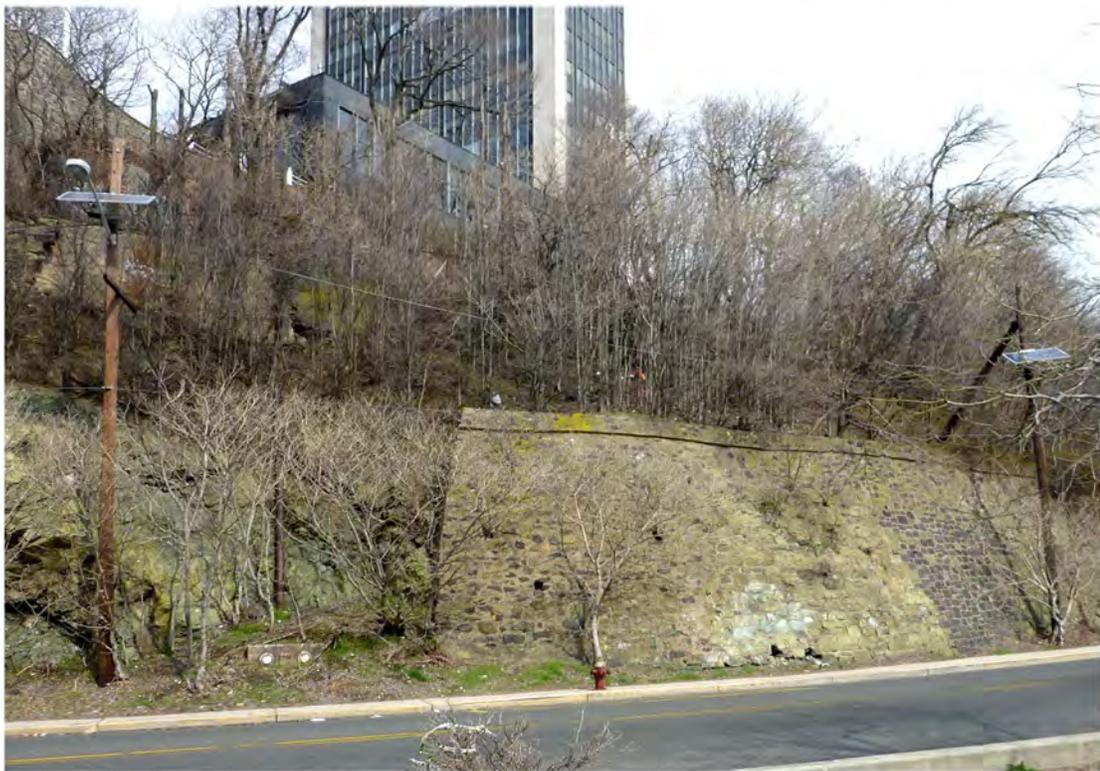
The ca. 1857 serpentine stone retaining wall below Castle Point Lookout near the foot of 7th St. at FSD, looking NW (2014).
